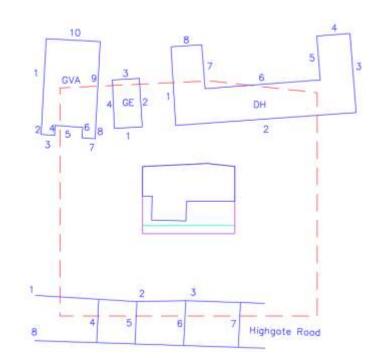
Simplified scheme and nomenclature for building façade/masonry wall elements (blue), proposed (magenta) schemes, and excavation zone of influence (dashed red).
